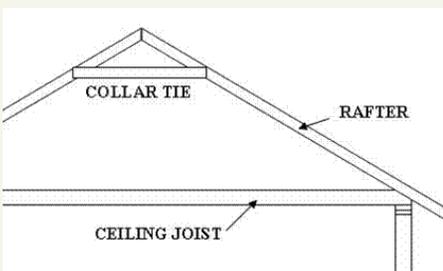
Typical roof framing. Image: www.diychatroom.com. Accessed June 30,
